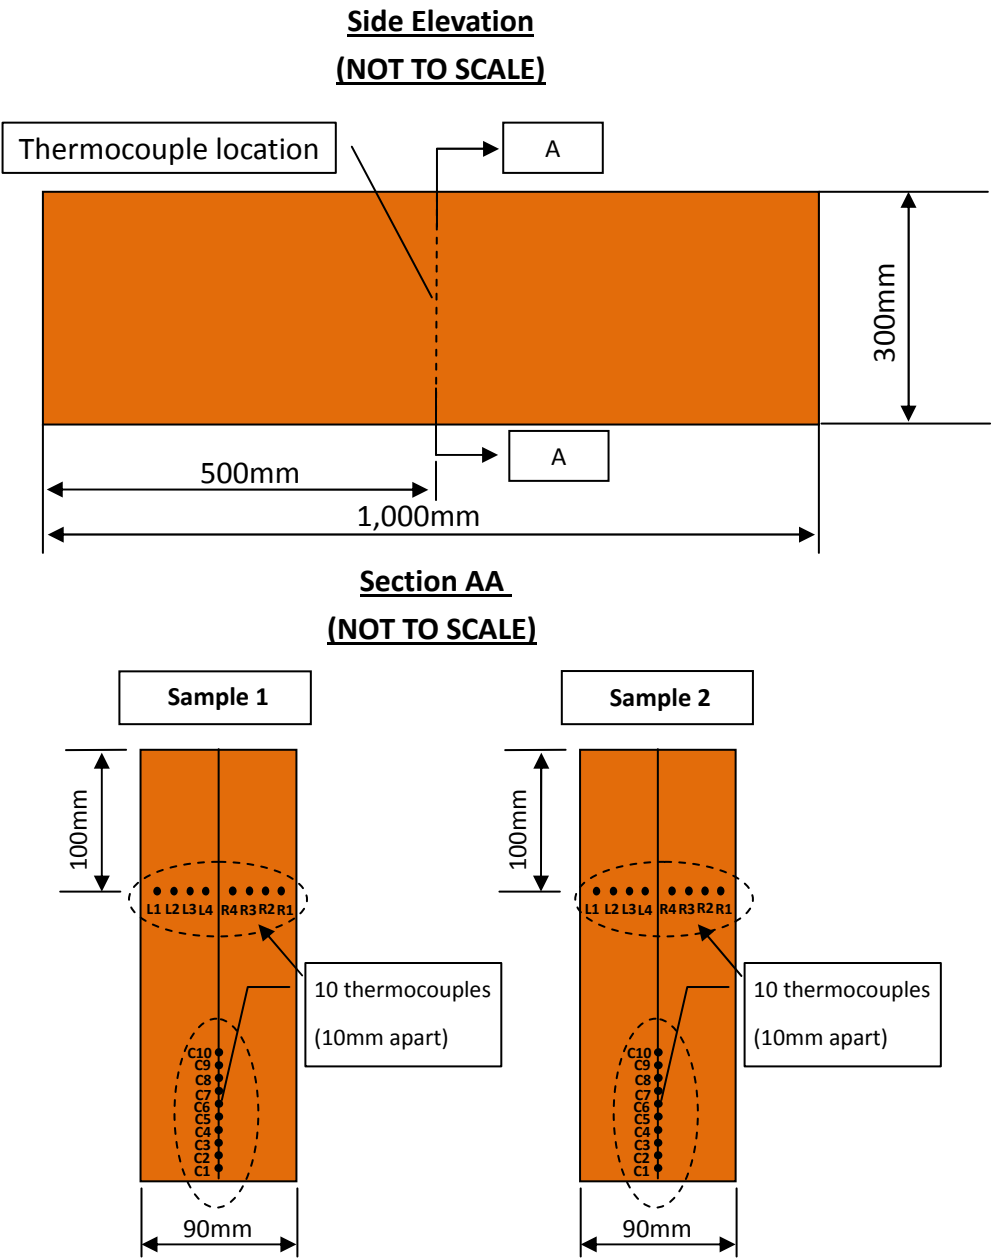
Thermocouple layout and dimensions for the fourth pilot furnace test
